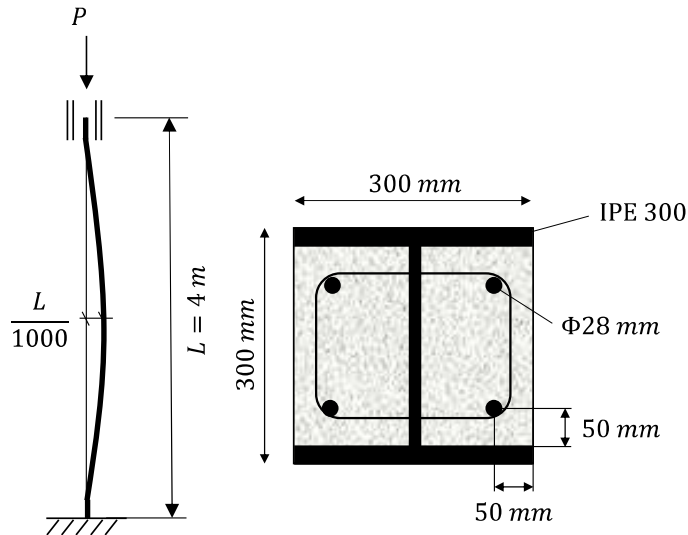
Composite steel-concrete column (Gernay et al., 2019): (a) elevation; (b) cross-section
